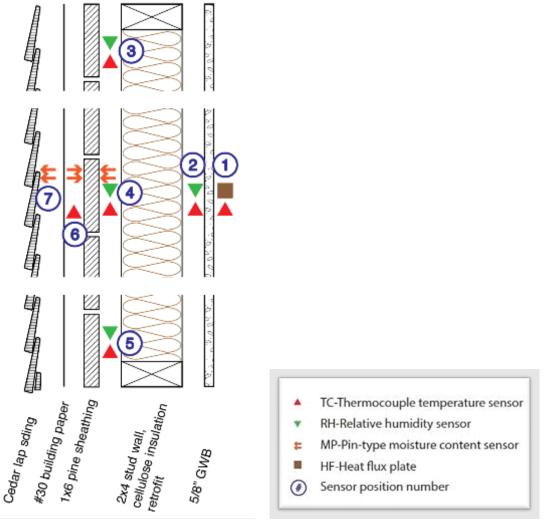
Example Test Wall Sensor Layout at the CRRF Test Facility
